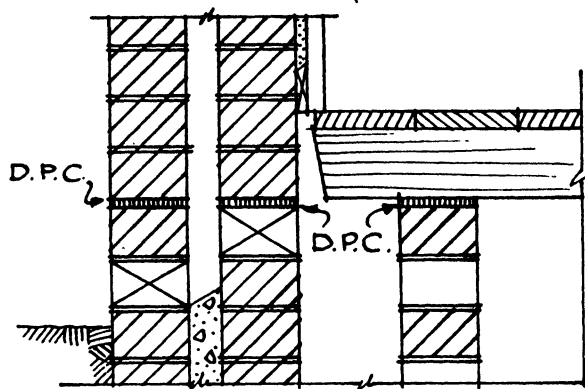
D.P.C. in Cavity External Wall—Hollow Floor. (Floor Level independent of Ground Line if built on Sleeper Walls.)
